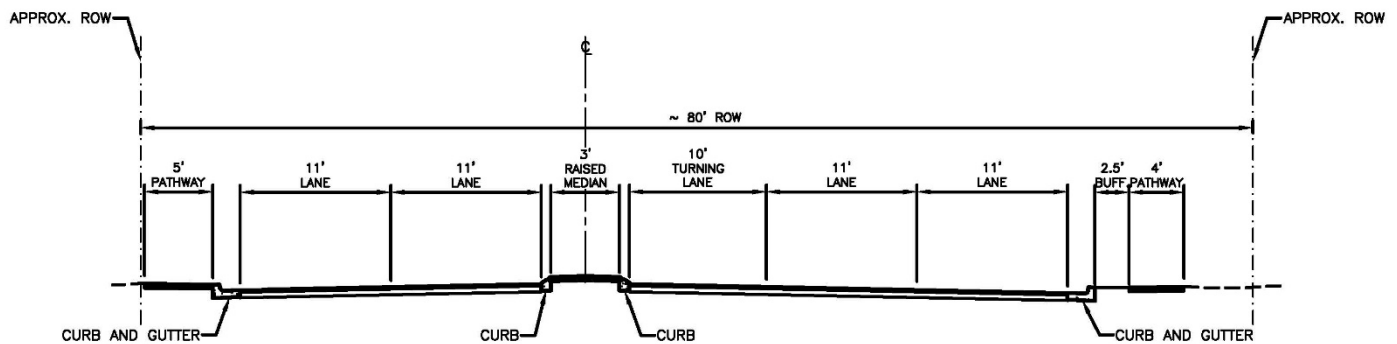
36th Avenue just west of the intersection at LaTouche Street, looking east
